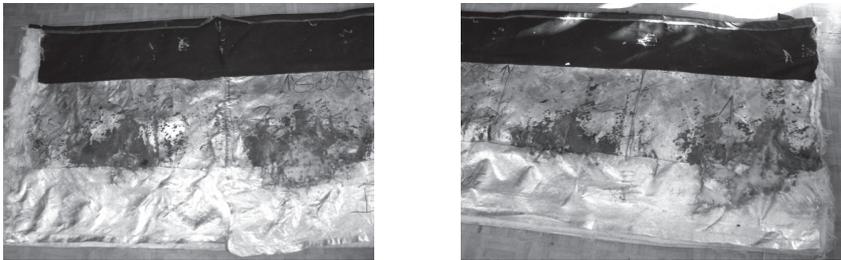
A view of sample of destroyed surface of cylinder cover version II.
